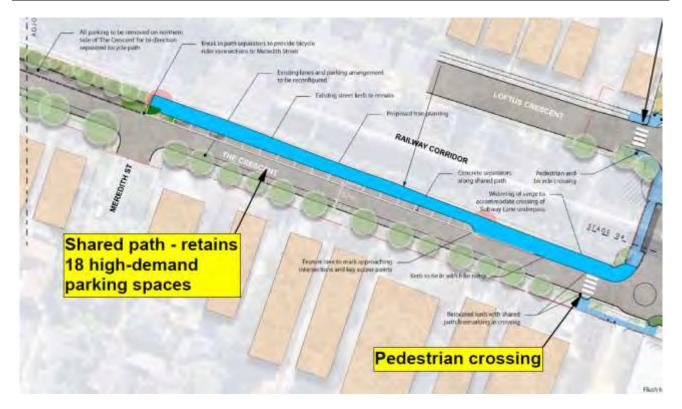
Section 2 of the HMaPP between Meredith Street and Subway Lane
